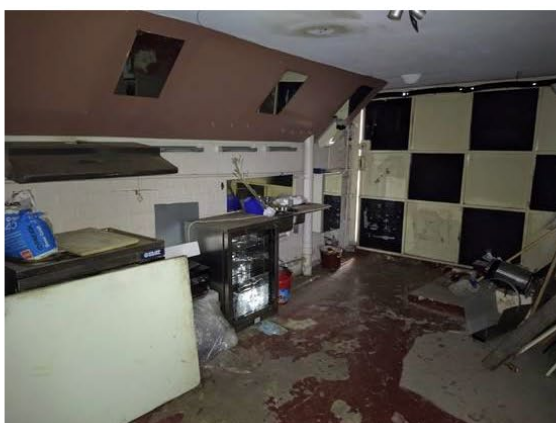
12. Interior facing out to Queen Street left side - Cafe (Pahos, 2021)
